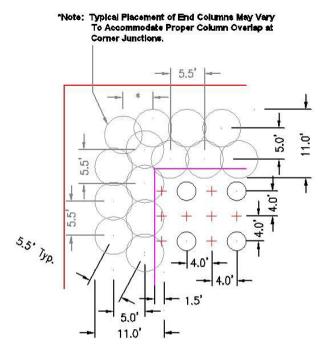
Typical plan detail for the stone column and wick drain treatment at the Marina del Rey case history.
